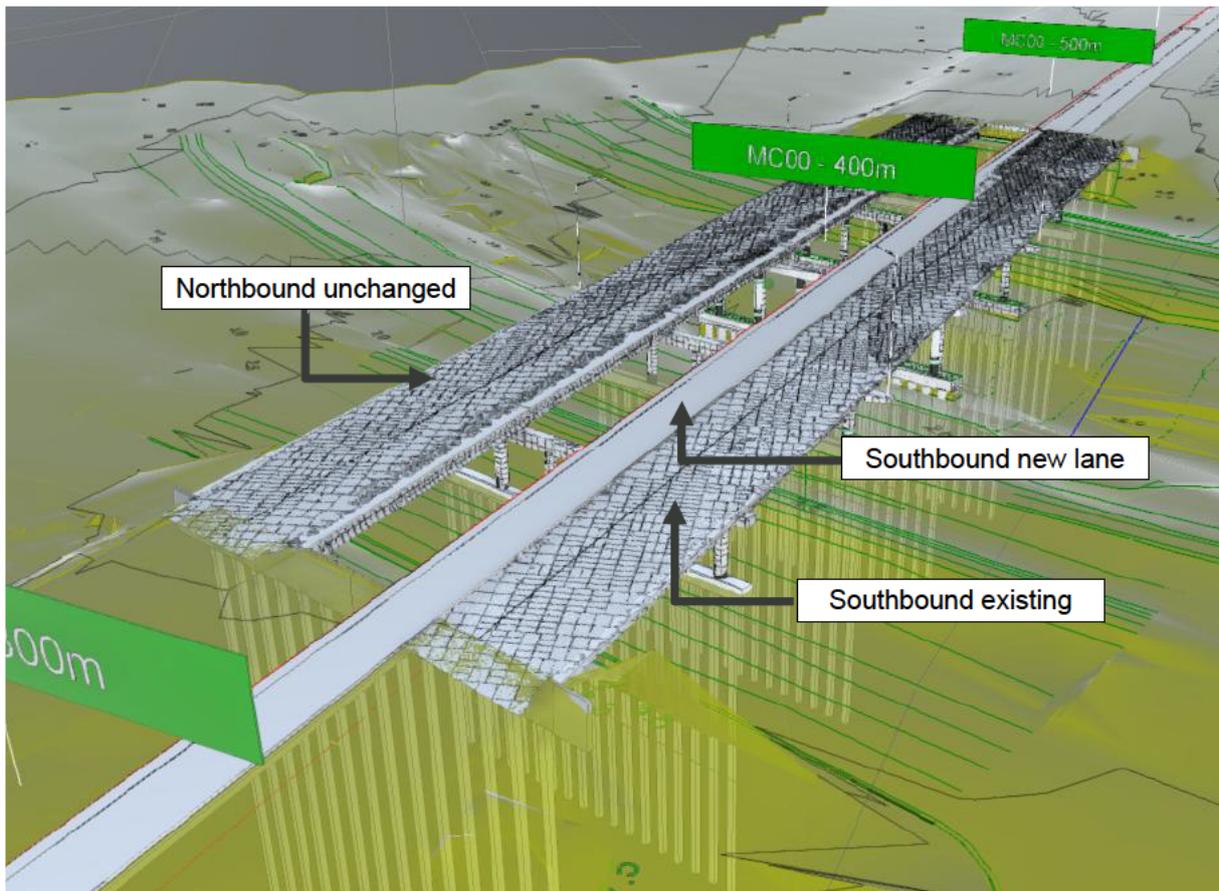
3D Illustration of Kaiapoi Bridge Design
